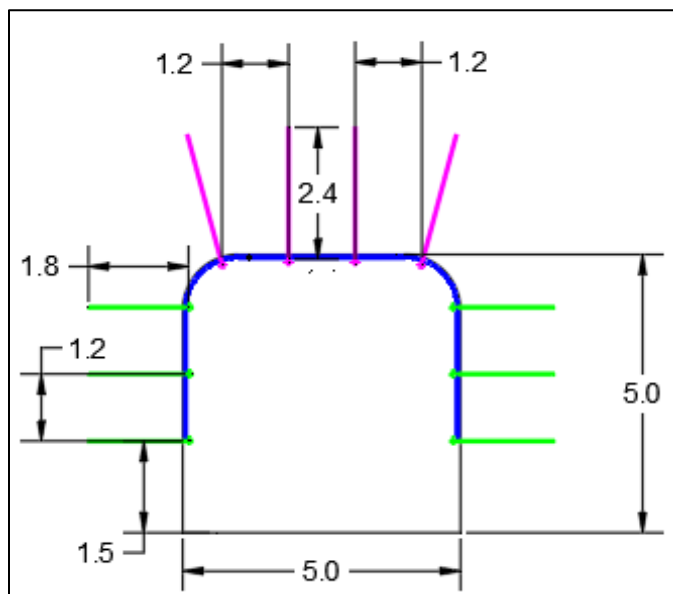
Simplified Typical Ground Support Section (wall bolts (green), back bolts (magenta), mesh (blue)) (prepared by Wood, dated 2021)
